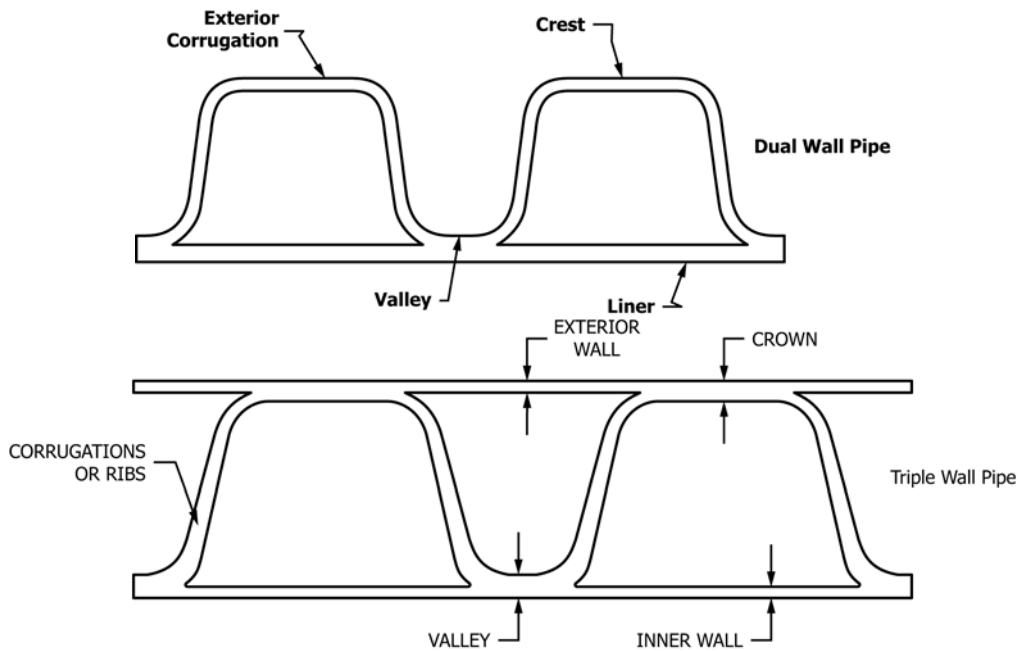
Typical Dual and Triple Wall Pipe Profile
